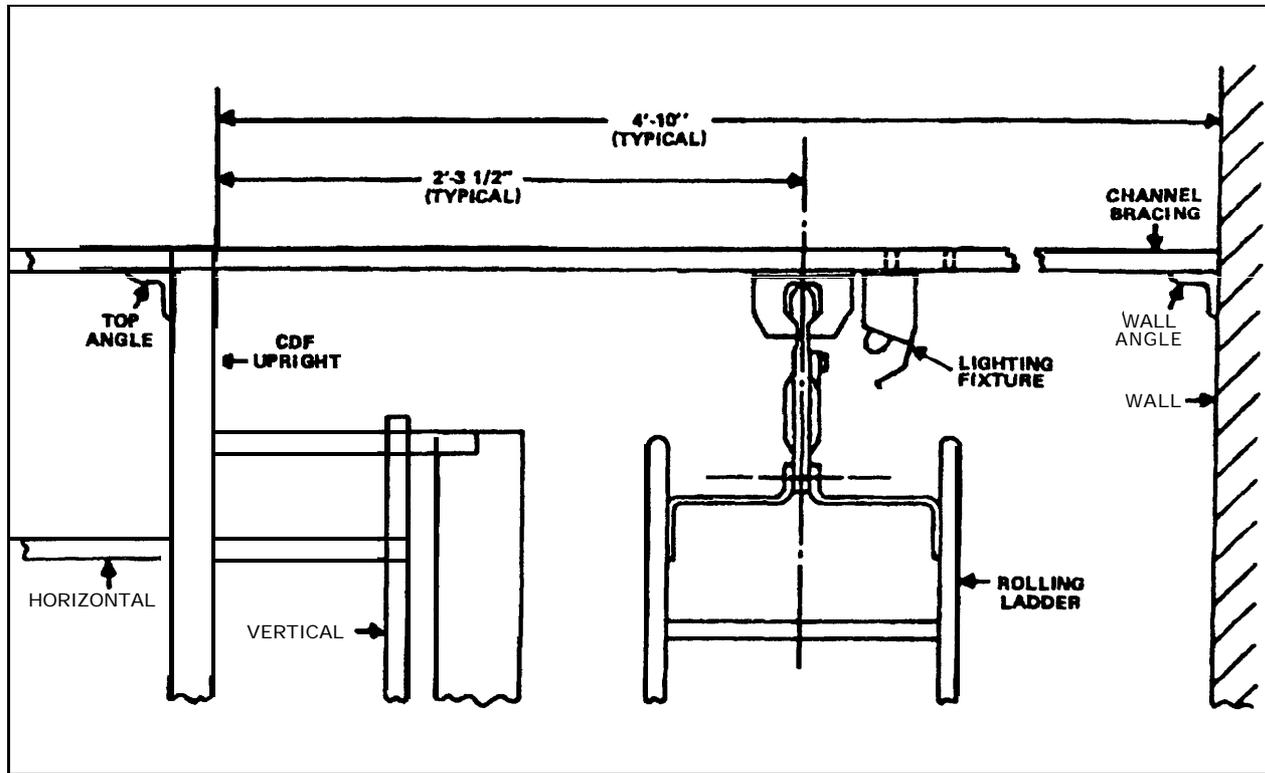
Typical Placement of Lighting Between Distributing Frames and Wall (With Ladders)
